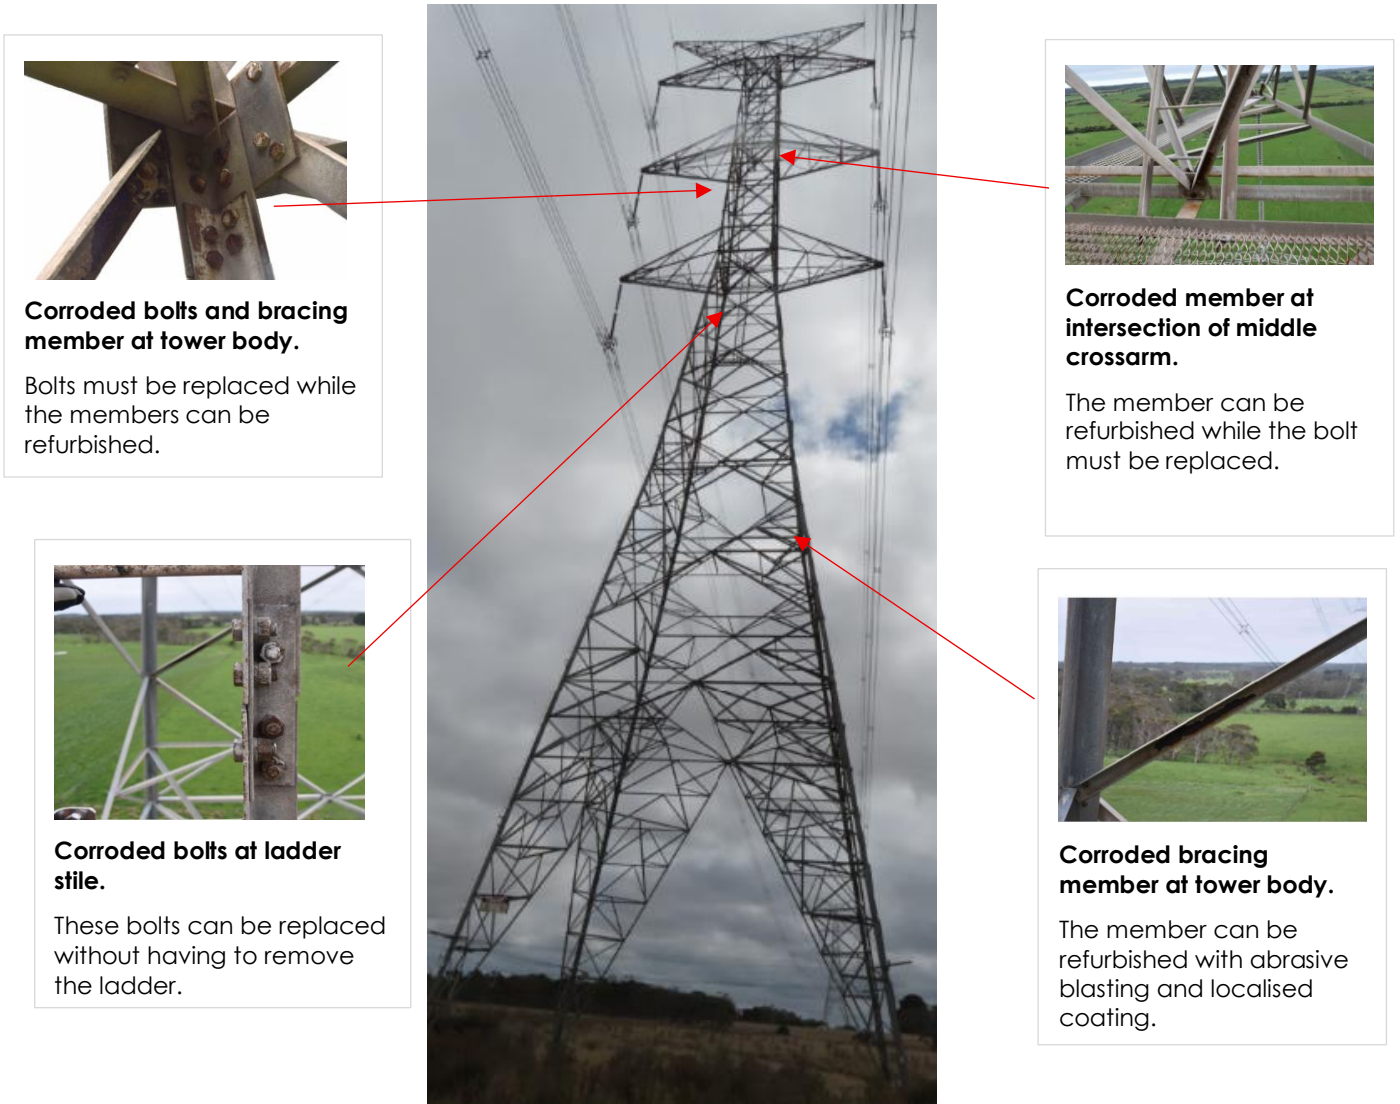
T603, corrosion of conductor plates & members, bracing members, crossarm bottom chord & bolts
